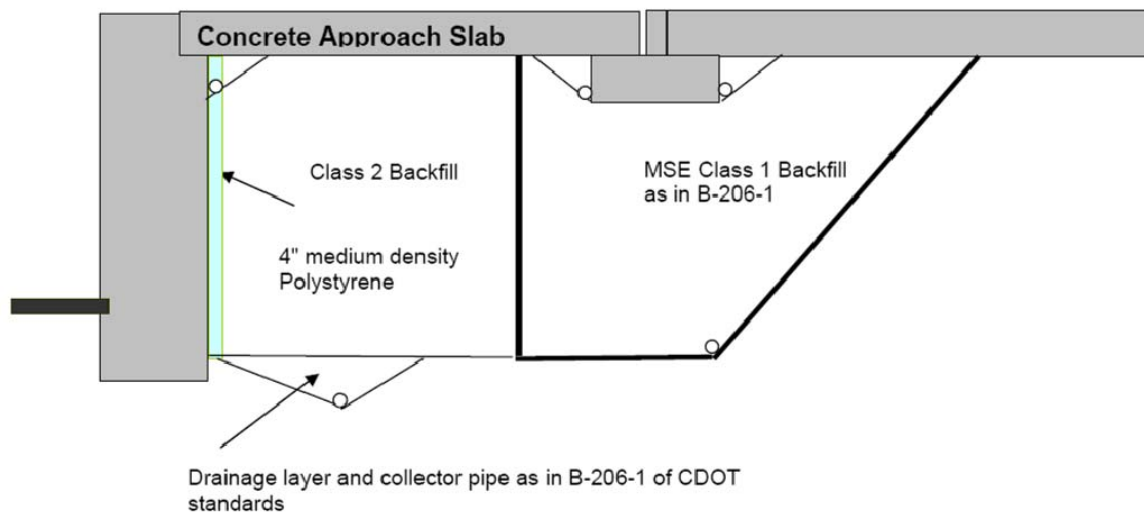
MSE Walls System under Sleeper Slab (Abu-Hejleh et al., 2006)
